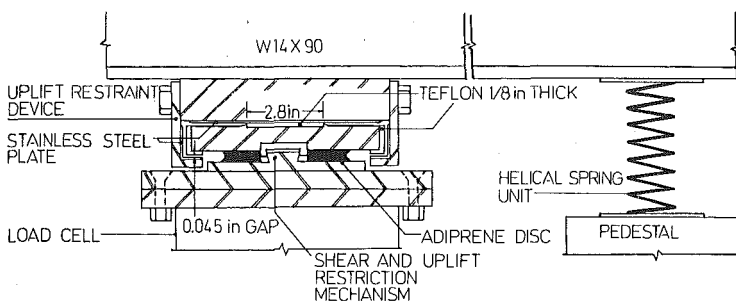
Section of Teflon Disc Bearing with Uplift Restraint Devices, Perpendicular to Testing Direction, and Helical Spring Unit (1 in. = 25.4 mm)
